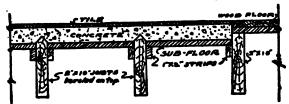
Section of Tile Floor Laid on Wood Joists.
